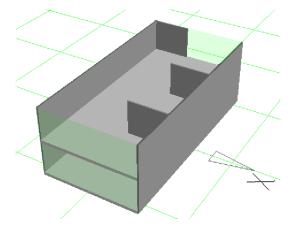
A two-story house with confined masonry walls and concrete roof slab (not shown). Two long boundary walls resist shaking in the direction of the building length. Three shorter walls resist sideways shaking (X-direction). Columns and partition walls are not shown.
